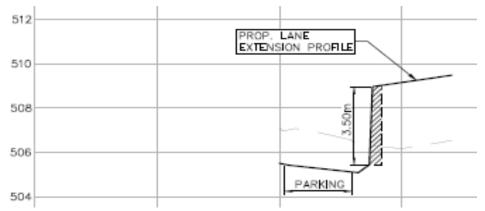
Over-height retaining wall No. 2, section drawing (blue).
